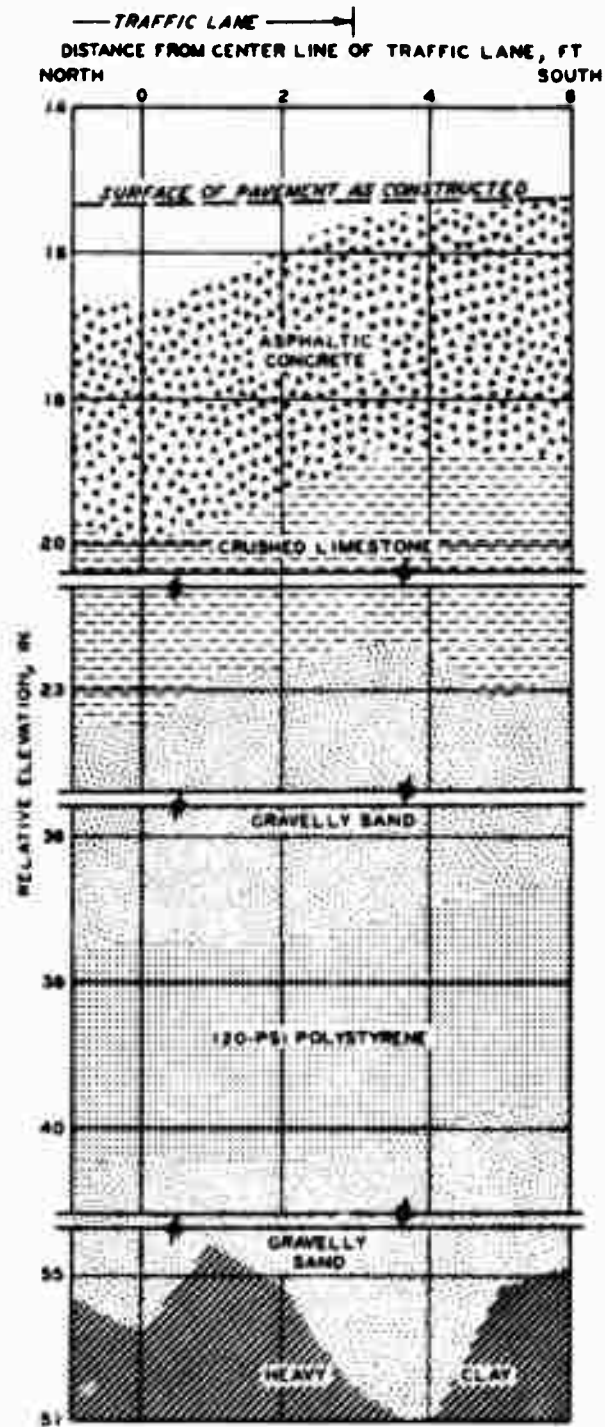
Test pit profile of subitem 5c, lane 3, flexible pavement test section. Station 1+85 after 240 coverages of 50-kip single-wheel assembly
